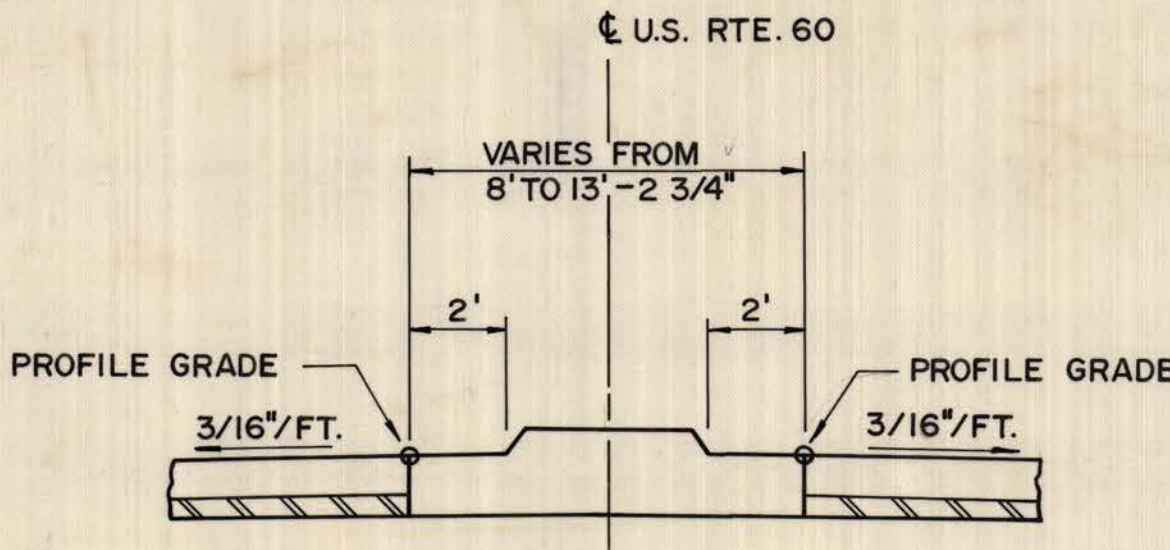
DETAIL TRANSITION OPEN DITCH TO CLOSED DITCH
